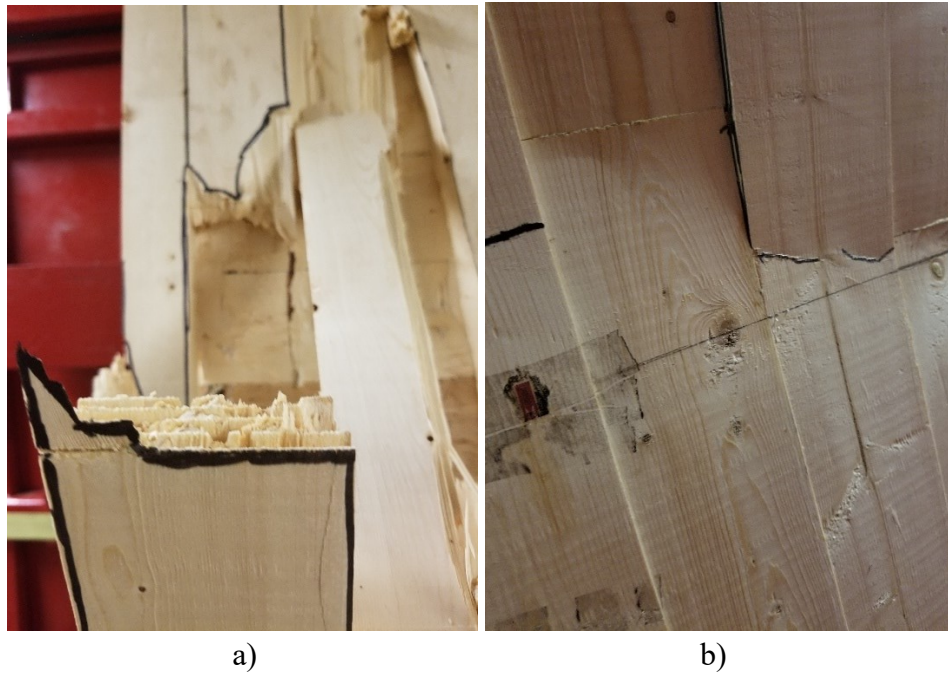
CLT1.1 failure details: a) Finger joint failure b) Compression wrinkling
